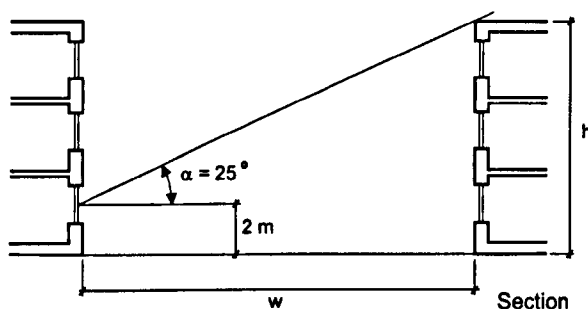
Section of a street with the 25° angle delimiting the height of obstructing buildings for new developments in England. The reference line for this daylight calculation is 2 m above ground.
